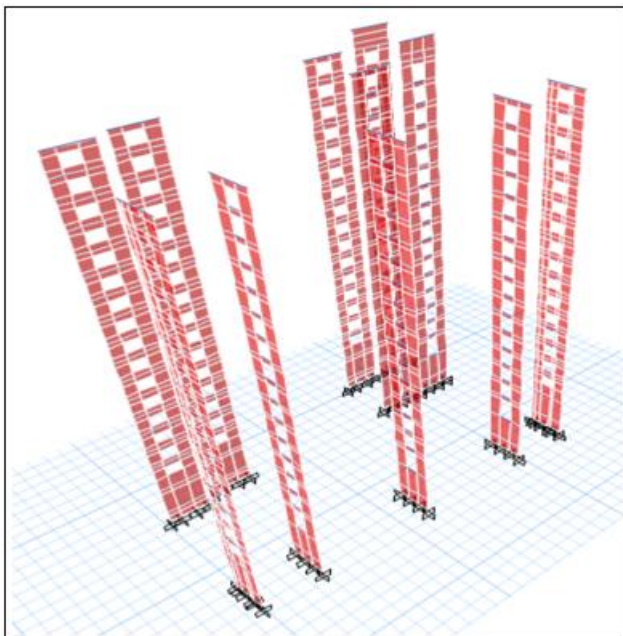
Etabs 3-D View for Vertical Opening (Model-1)
